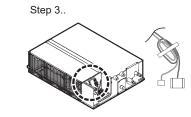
Liquidtight 3/4 Inch Elbow Connector Attached to Flexible Conduit.
